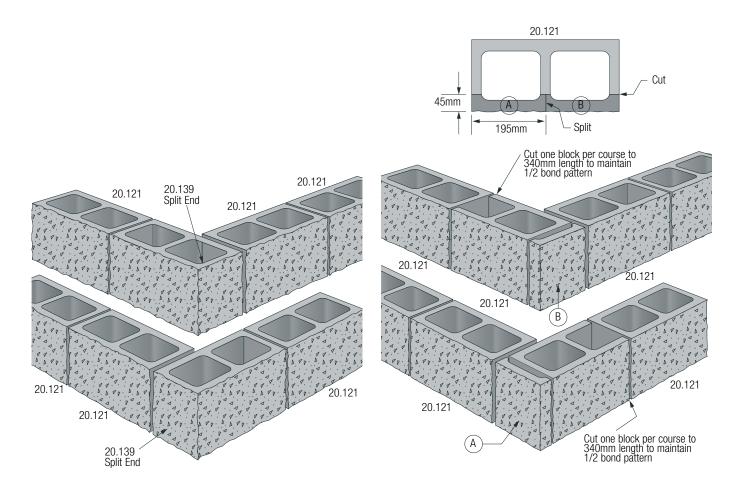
Corner Bonding Details Series 200 Split or Smooth Face Designer Range Blocks
